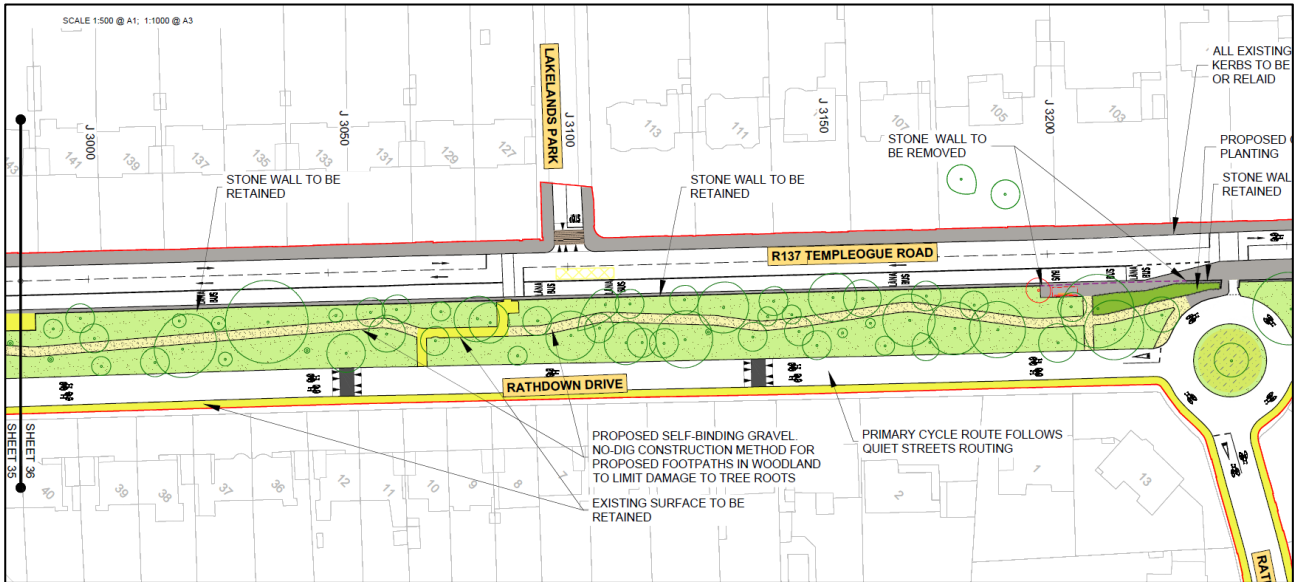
Extract from Landscaping General Arrangement Drawings (Sheet 36)
